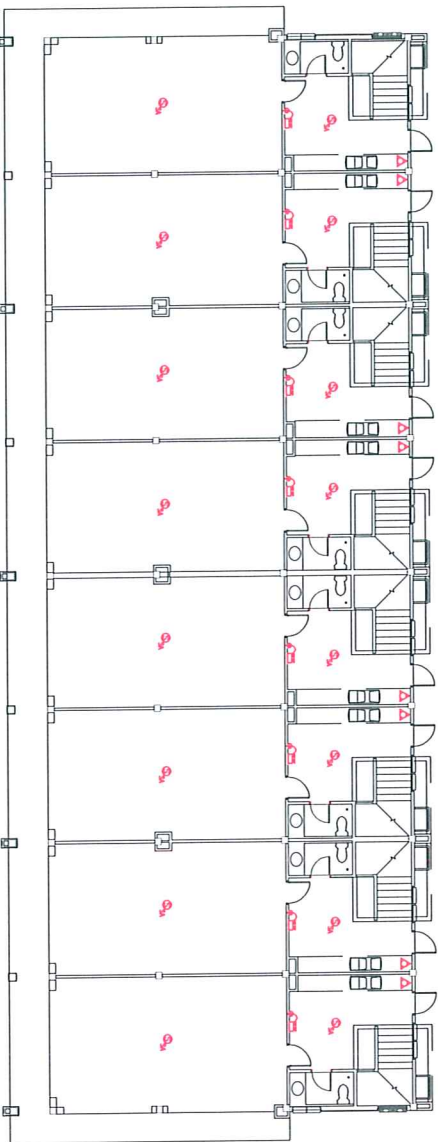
FIRE ALARM EMERGENCY EXIT LIGHT SYSTEM FOR 1st. FLOOR (STAFF SHOP)
